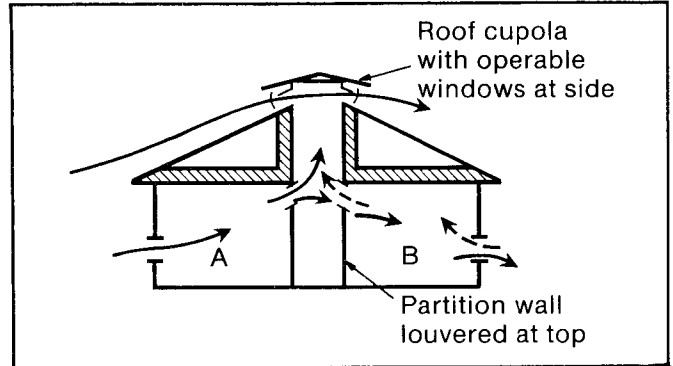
Whole-House Ventilation Through Roof Level Outlet Windows and Low Inlet Windows (Dotted Arrow Shows Alternate Possible Flow Path)
